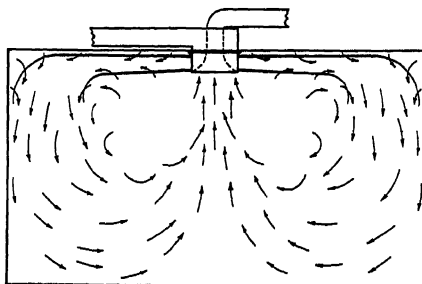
ELEVATION VIEW CEILING SUPPLY AND RETURN OUTLET
